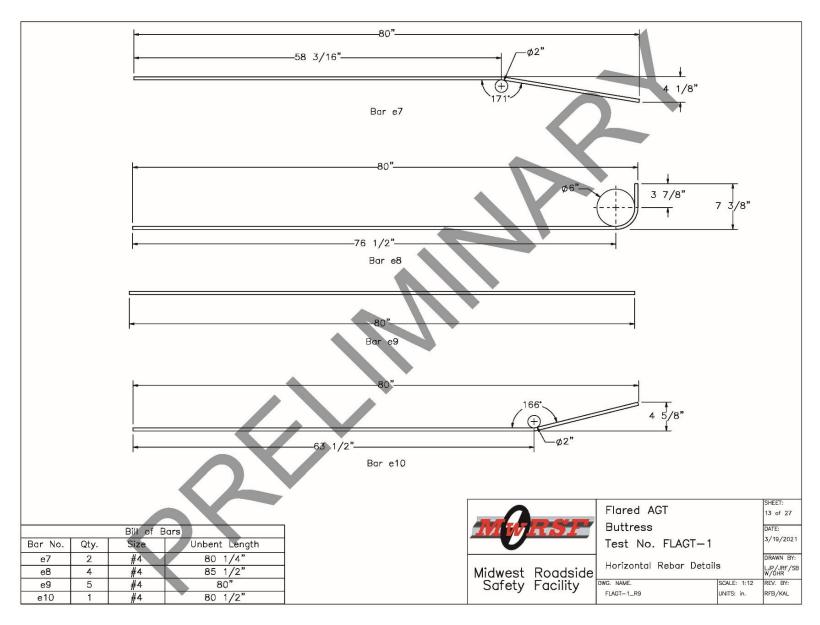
Horizontal Rebar Details, Test No. FLAGT-1
